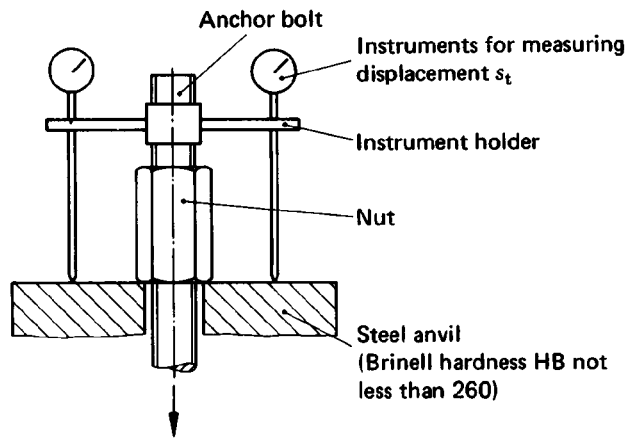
Test arrangement for testing anchor lock/anchor bolt assemblies
